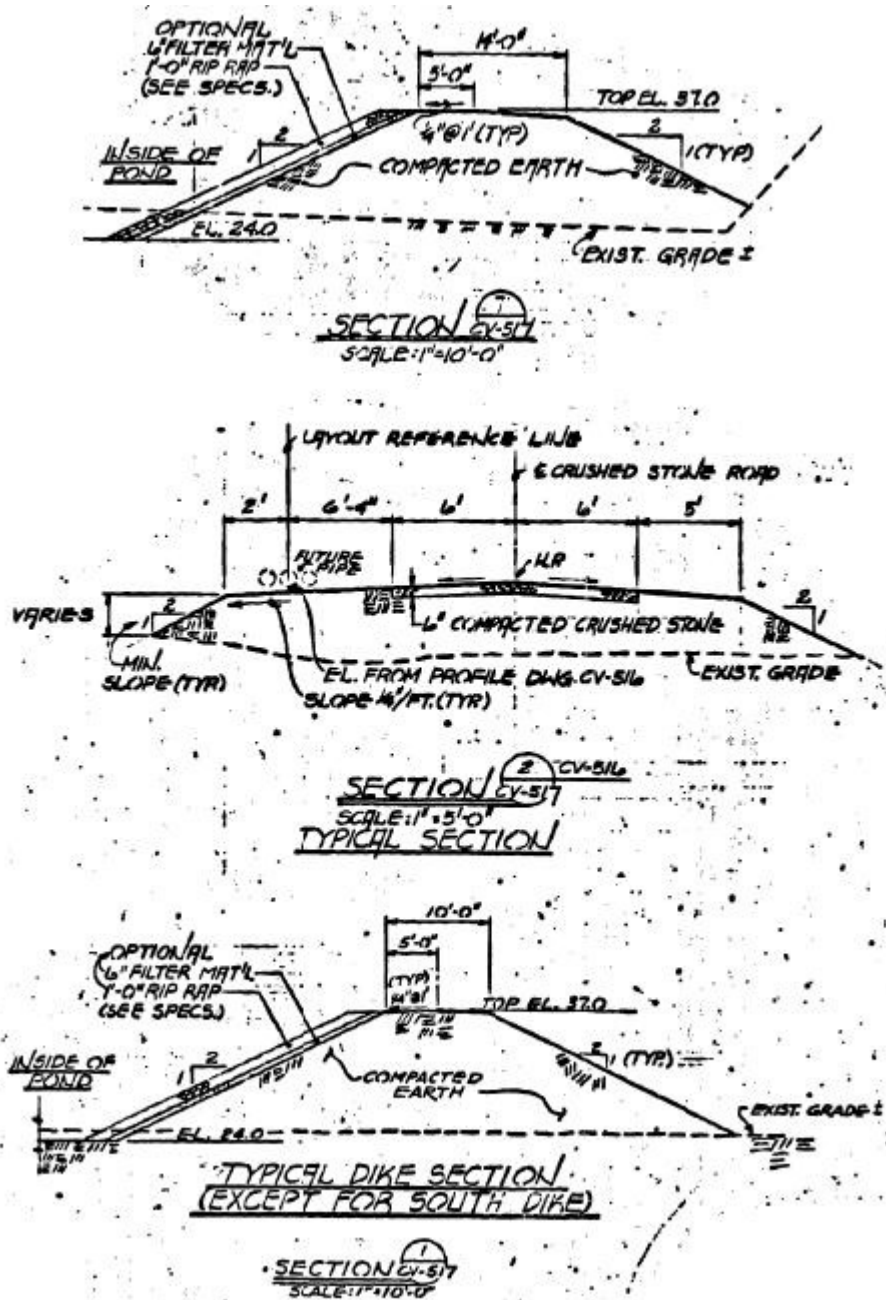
UNIT 3 & 4 SLURRY POND AND WEST ASH POND – REPRESENTATIVE SECTIONS OF EMBANKMENT
